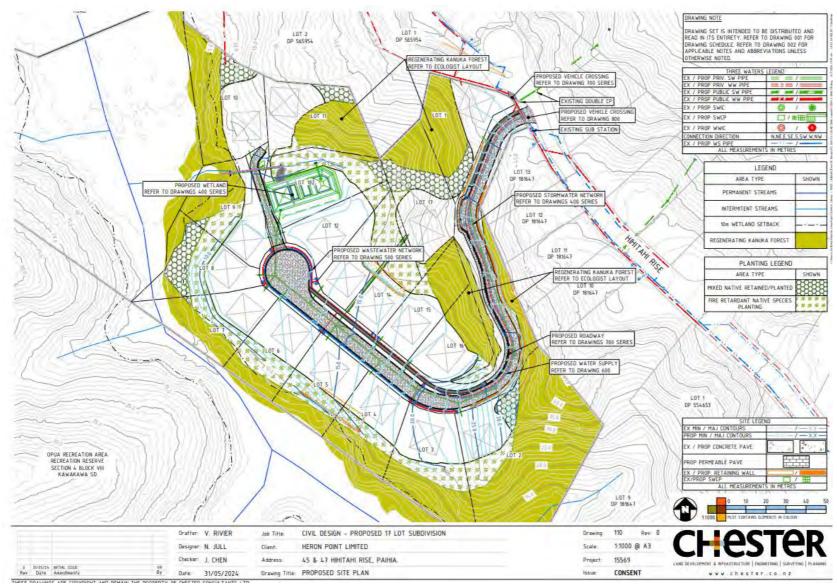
45 & 47 Hihitahi Rise, Paihia – Proposed Site Plan
